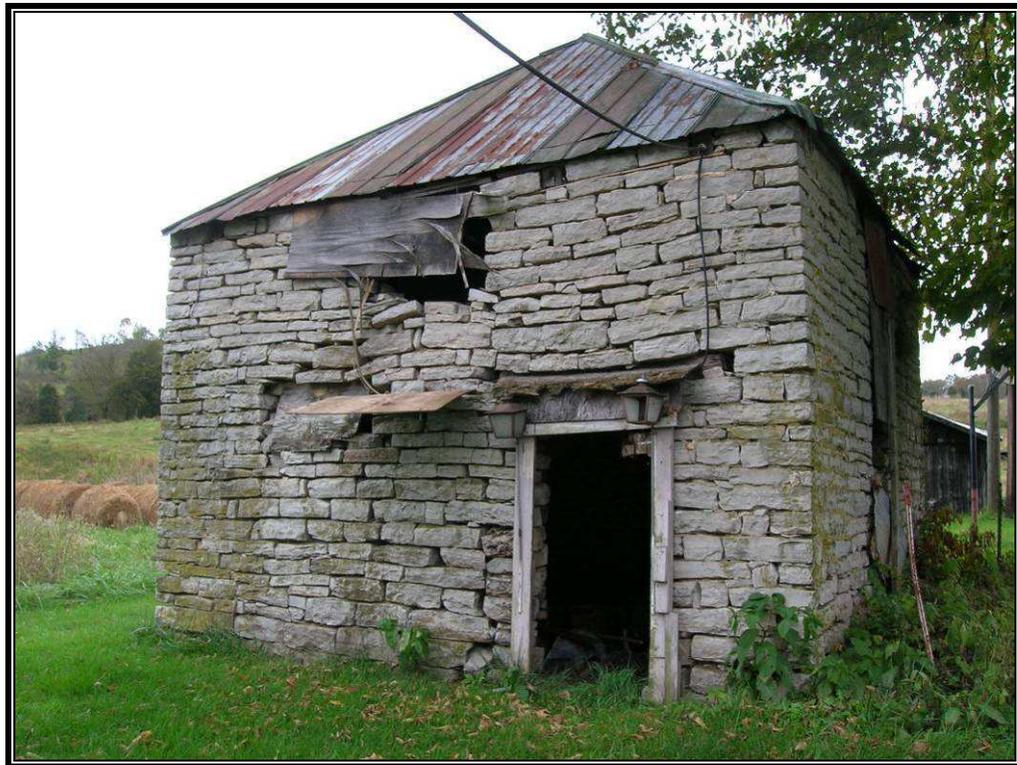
Site 30, Stone outbuilding (probable smokehouse), east elevation.
